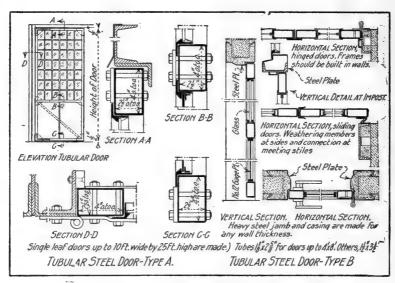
Details of "Lupton" Tubular Steel Doors.
